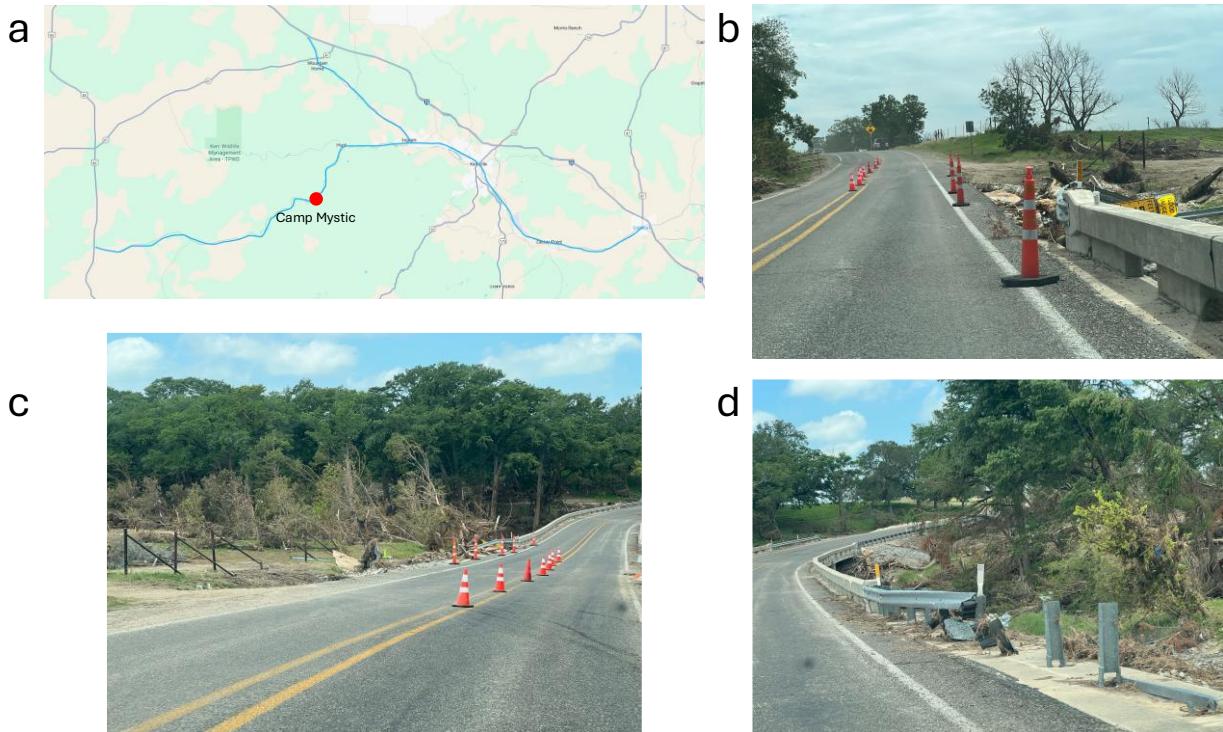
US0027/US0039 Case Study: (a) Location, (b)/(c) Typical Pavement Surface Views, and (d) Guardrail Damage View (Photo Credit: TTI, July 19, 2025).
